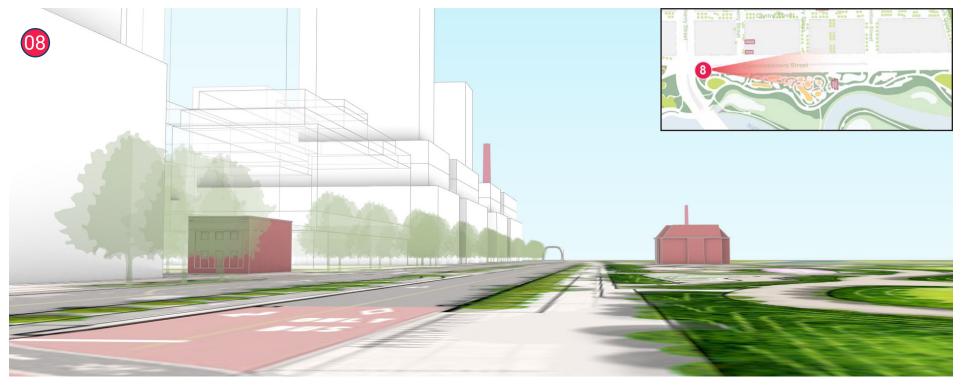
View of Fire Hall No. 30 looking east; from: Commissioners Street
